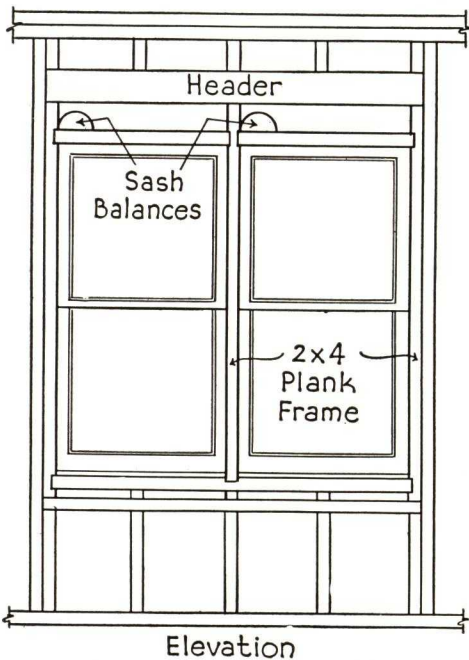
DETAILS OF N.S.W. WINDOW CONSTRUCTION
